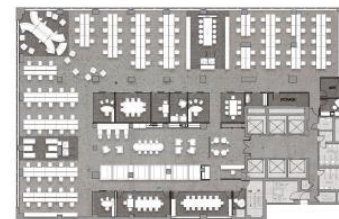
Open Floor Plan by Schrimmer Design (Vicous Partners, n.d.)
